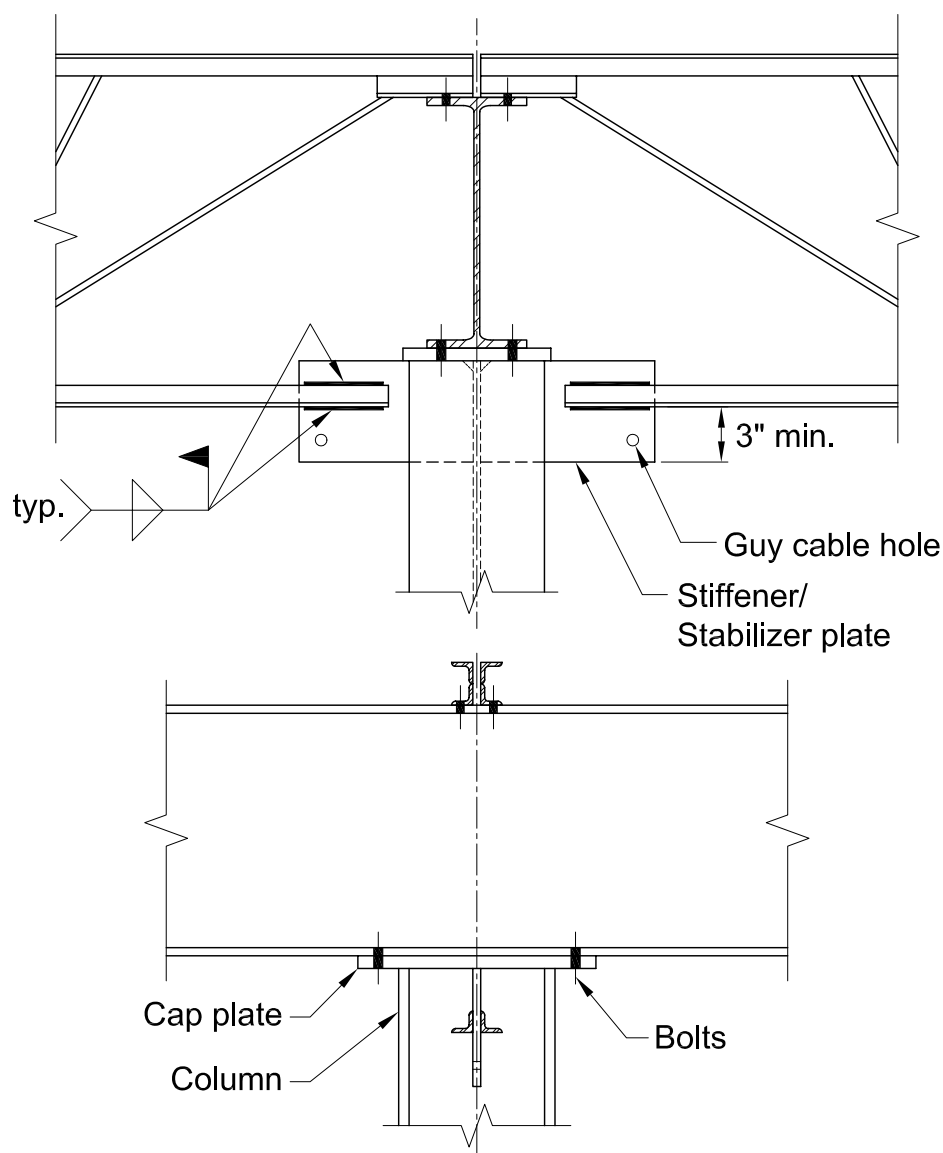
Beam framing continuously over column top, stability provided with welded joist-chord extensions at column top.
